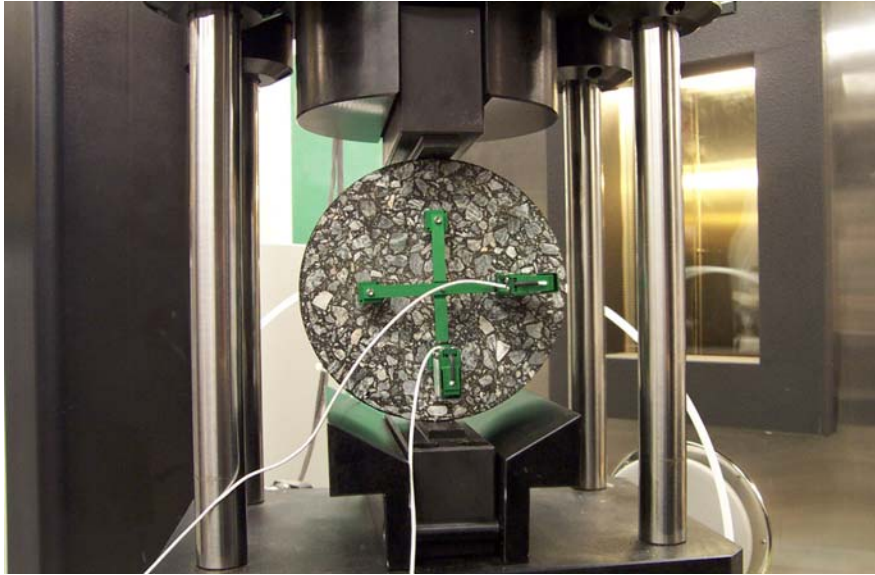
Indirect Tensile Fixture and Biaxial Extensometer Set
